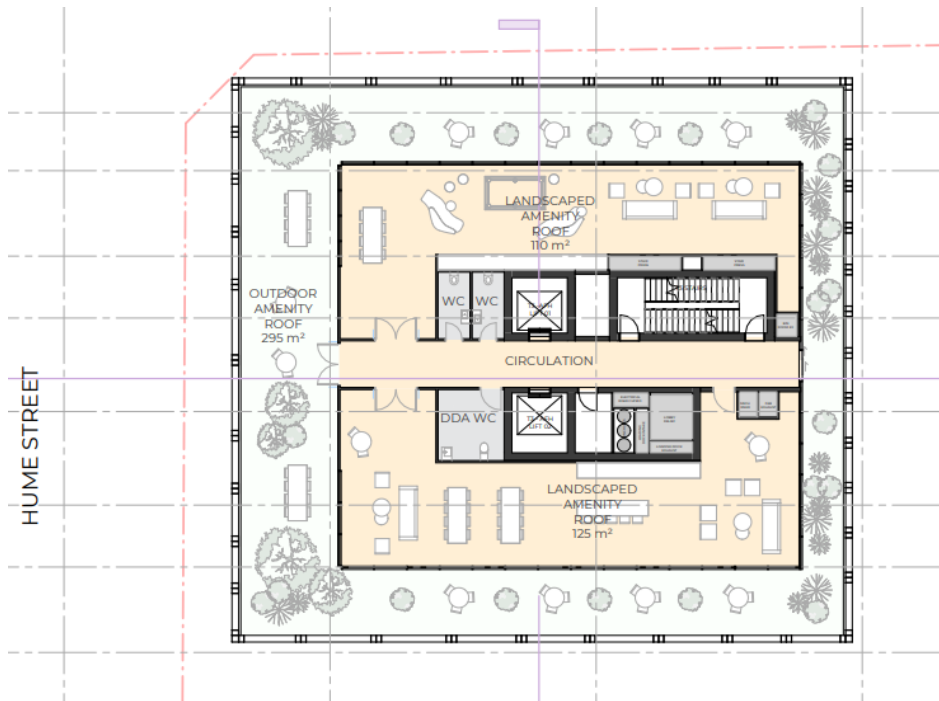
Indicative roof top plan AH towers (Source: Woods Bagot, Major Projects Portal)
